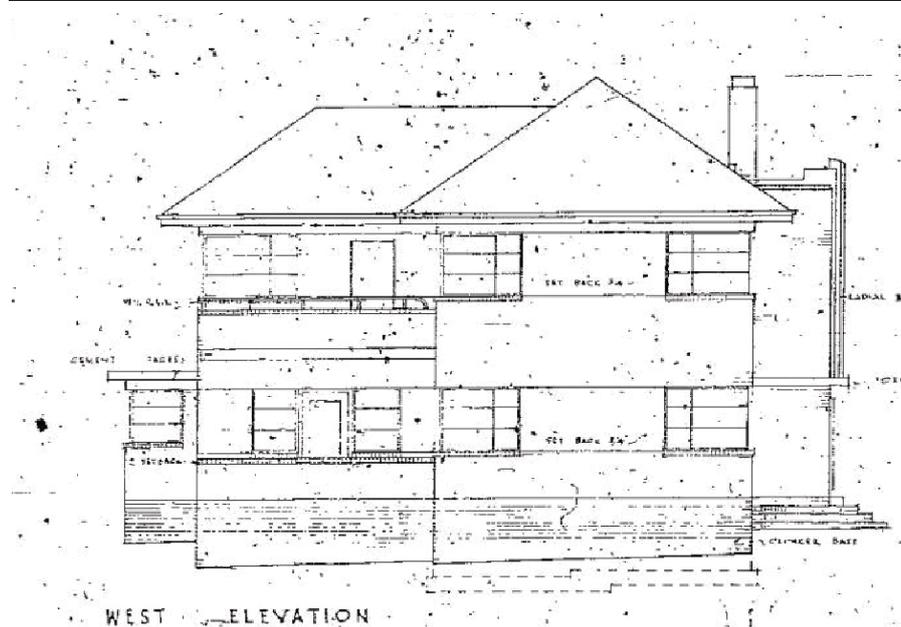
The west elevation, facing Narrak Road from the original house plans. (Source: City of Boroondara Building Permit 10142, dated 11 August 1938)
